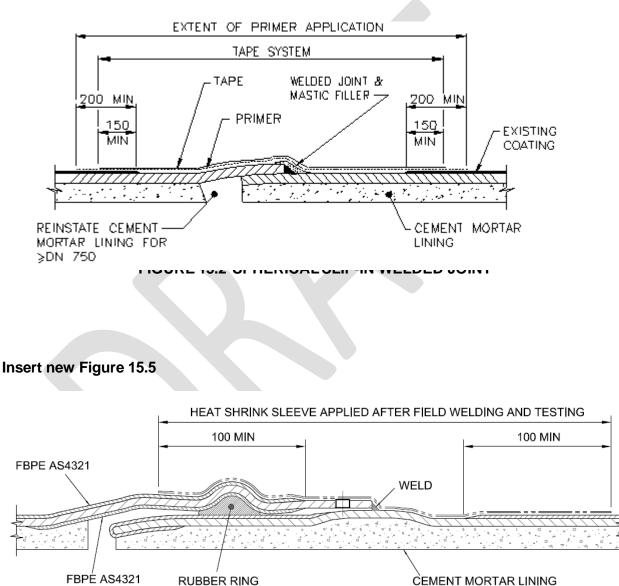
CML/FBPE WELDED JOINT (CLPEWJ)
